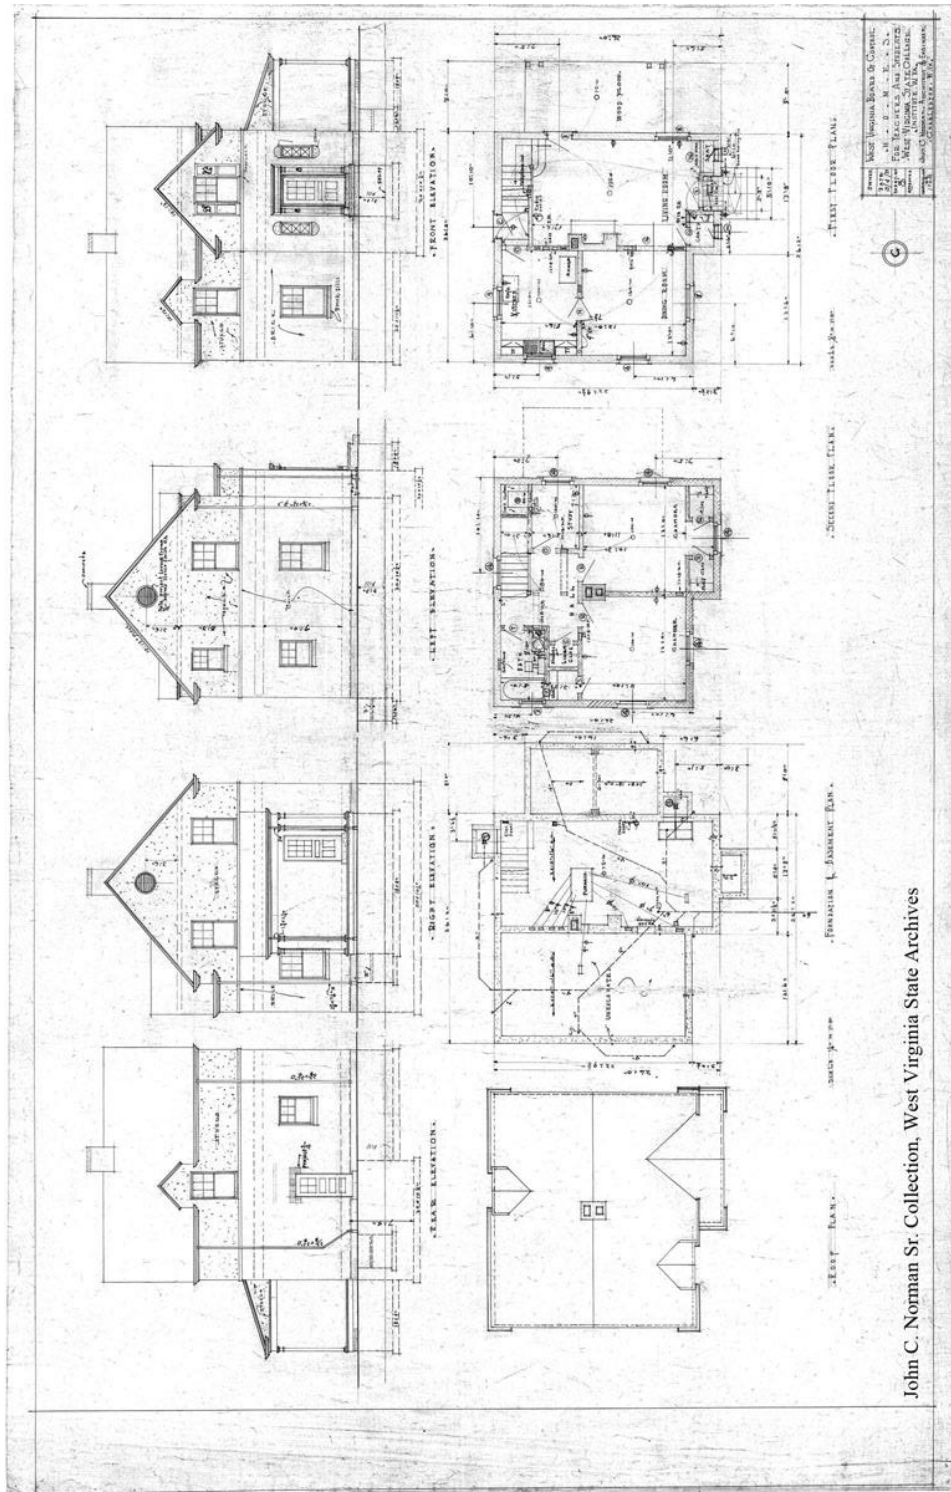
Faculty House G Floor Plan, Courtesy of the West Virginia State Archives, John C. Norman Sr. Collection
